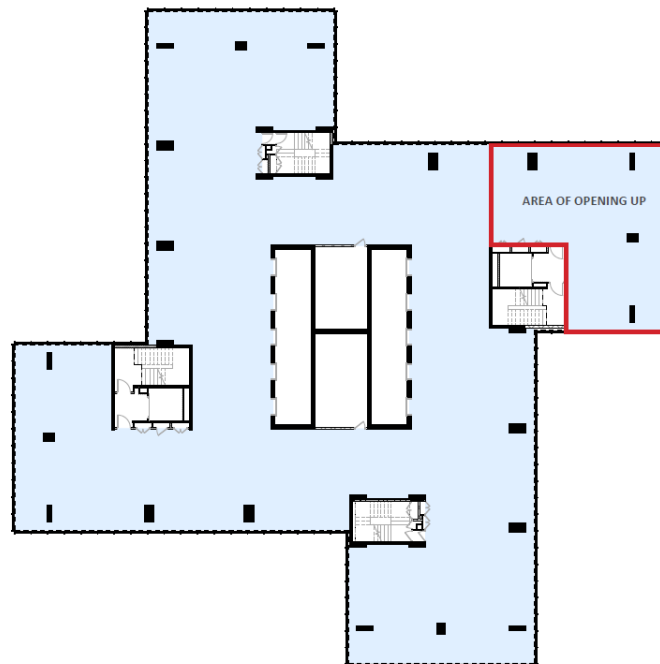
Existing typical floor plan. The spurs are known as North, East, South and West (image courtesy of 190925 ARUP Invasive Survey Report)
